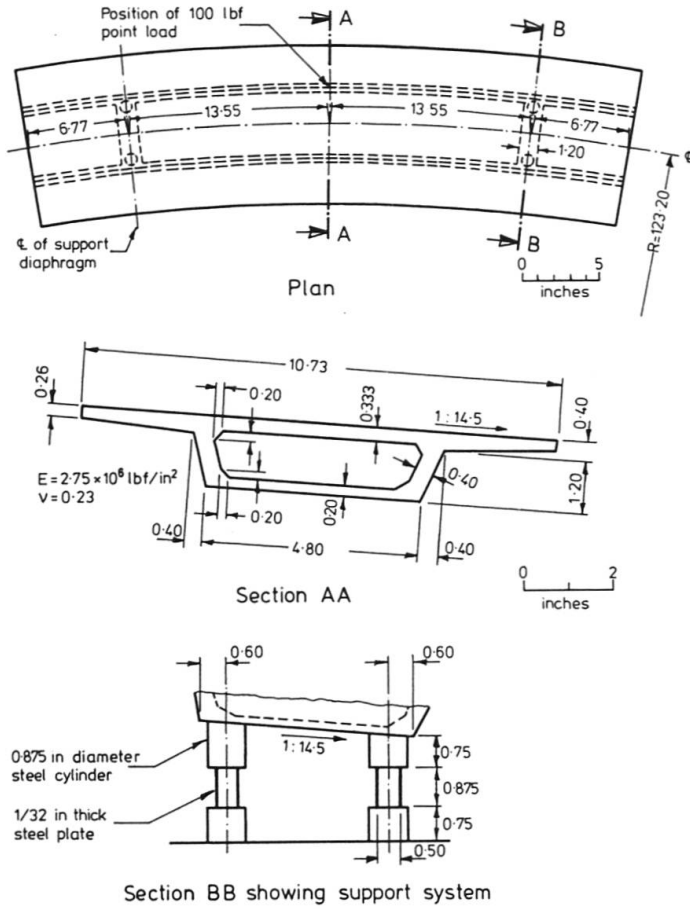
Curved single cell box girder bridge model. Details of model and loading
